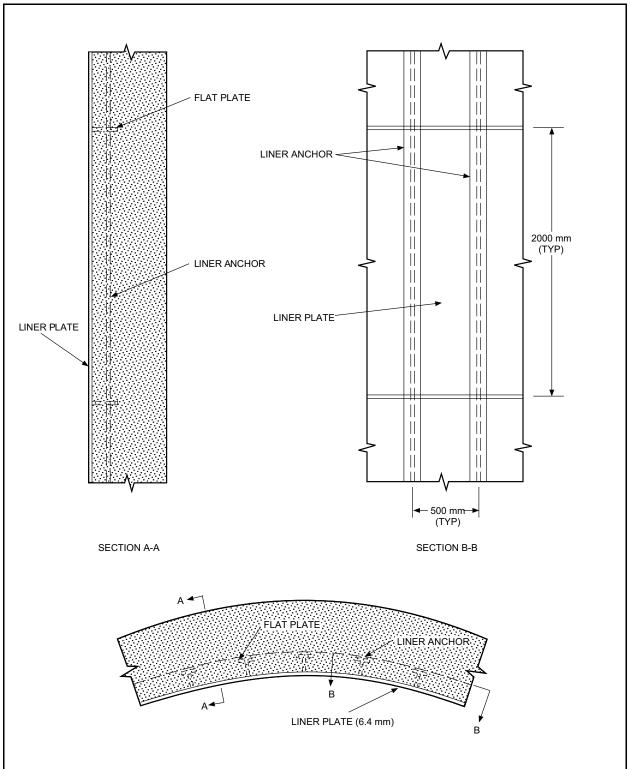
Typical Section of Containment Liner Plate and Anchor
